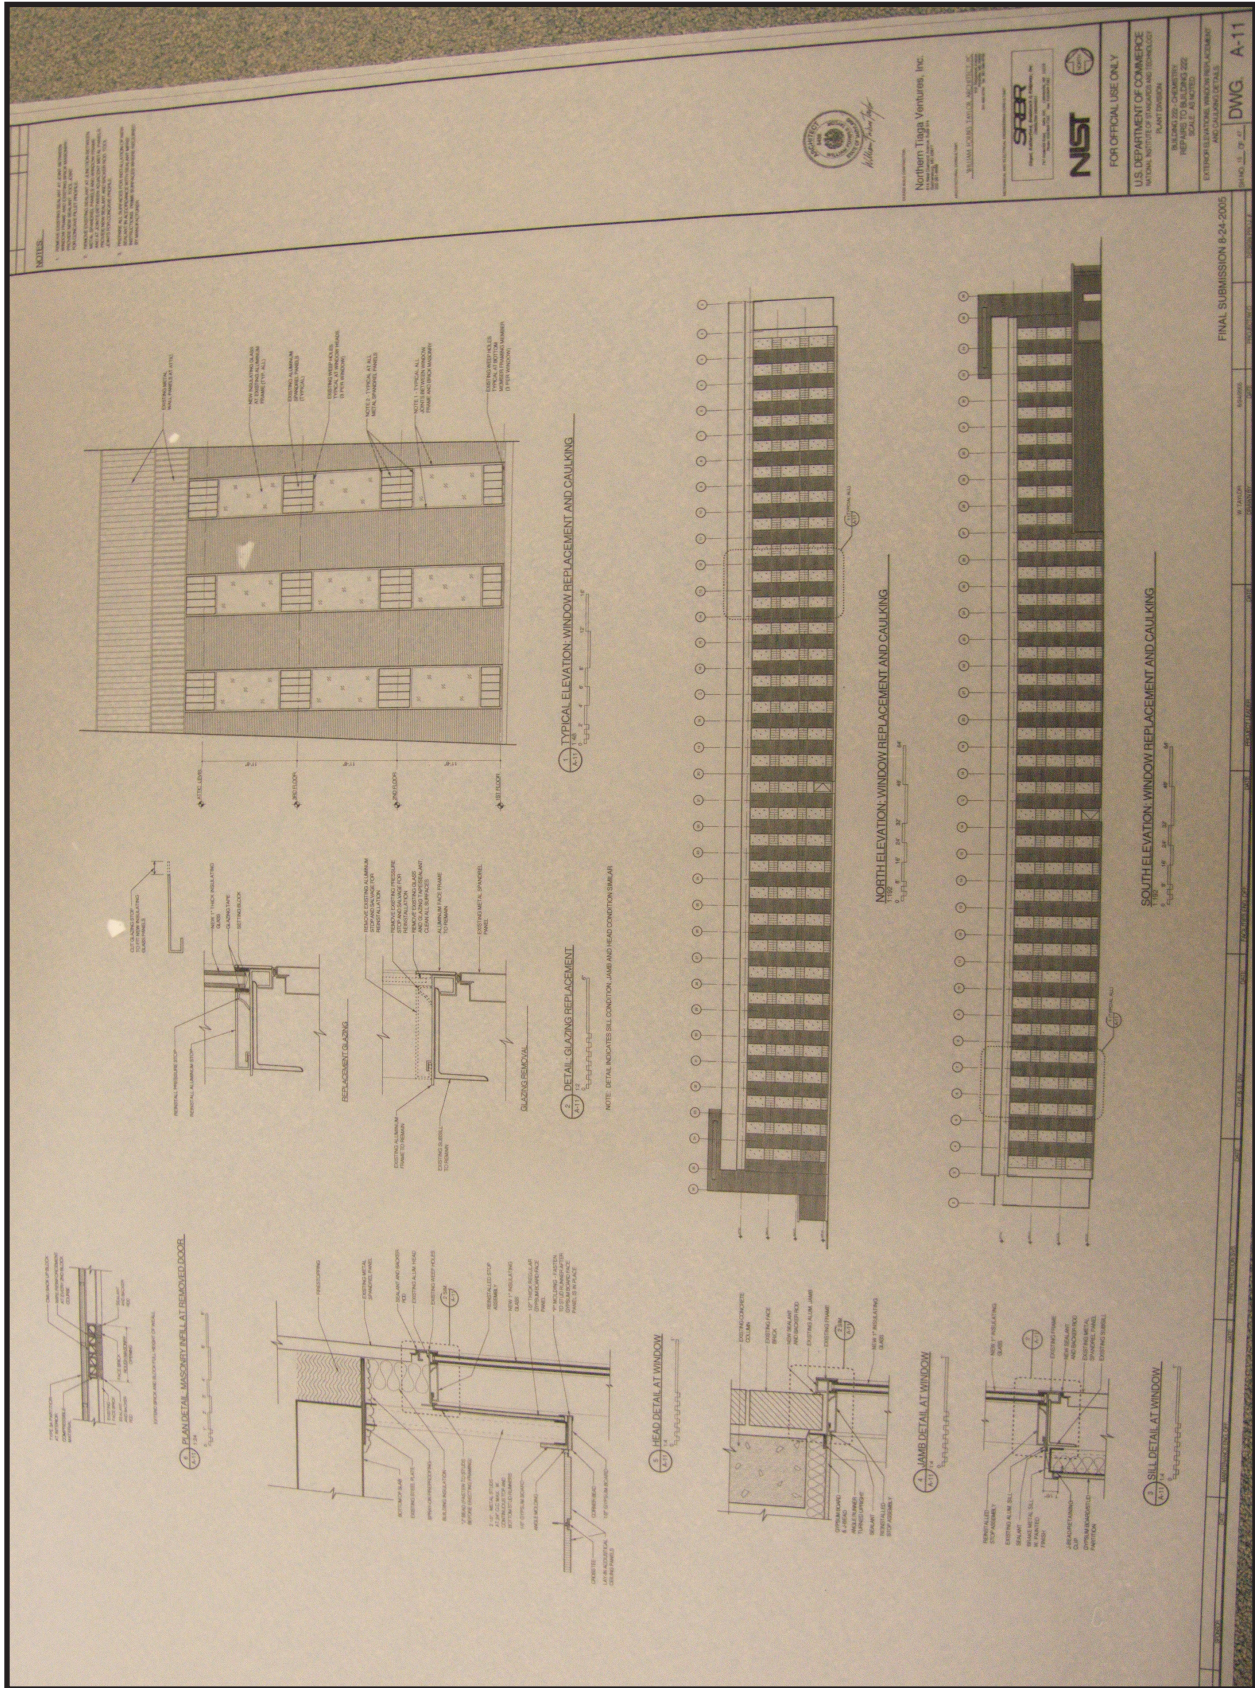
Building 226, Elevations and Window Detail (Source: NIST Office of Facilities and Property Management).
